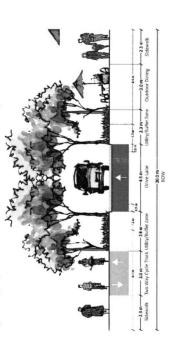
Kapyong Minor Collector Street Type C section with Outdoor Seating
